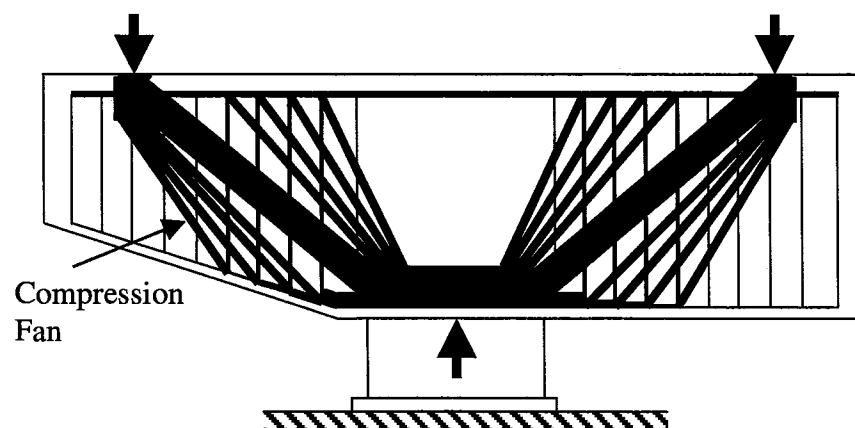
Bent Cap Truss Model with Many Active Stirrups.
